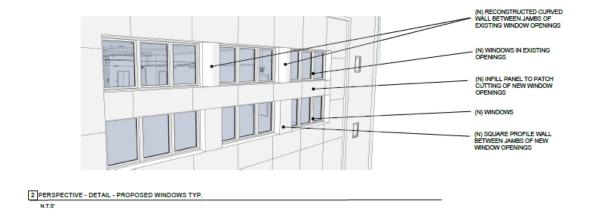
Existing east façade showing proposed enlarged openings (which will match the proposed alterations at the south façade. Source: Quezada Architects, "Amy's Kitchen – Site Plan & Architectural Review" (May 6, 2022), SPAR-201.
